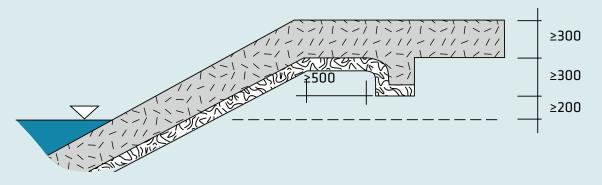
Typical anchor trench (all dimensions shown are typical values only)
